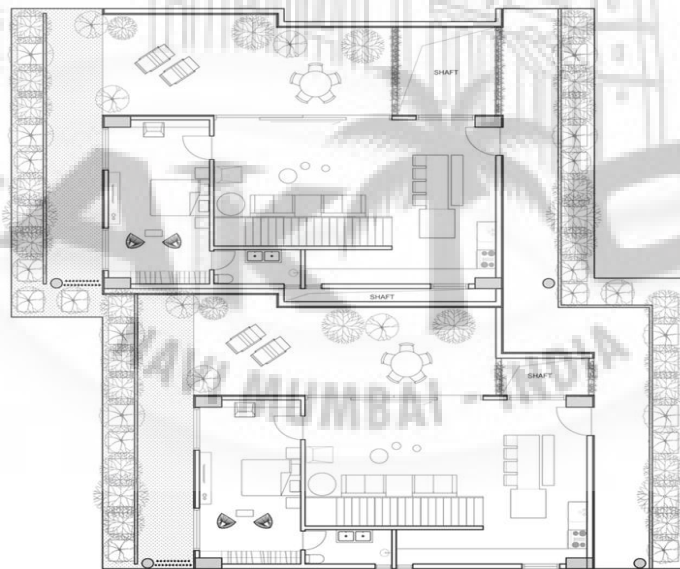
Magic Breeze Villa floor Plan (Source – Arcdaily)
